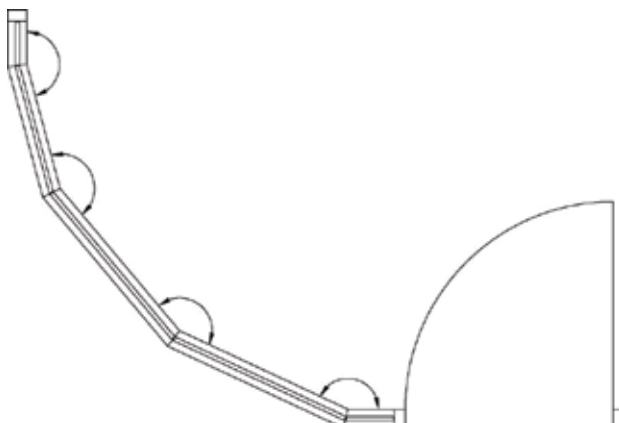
The above example of angle wall is an alternative for expensive constructions with bent glass. An additional value of such a solution is no deformation of the image when compared to the bent glass.
